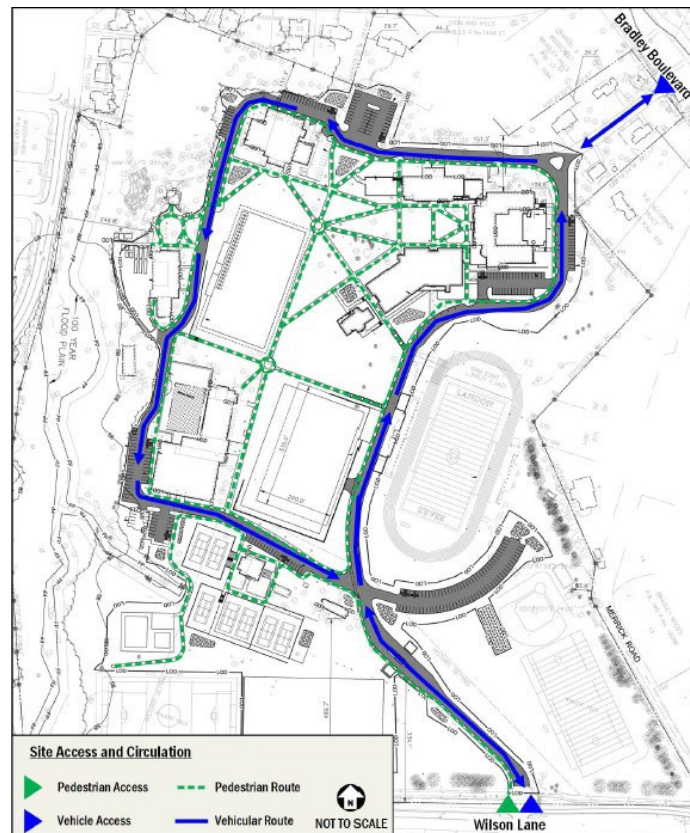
Proposed Site Circulation at Full Build-out of the Campus Master Plan
